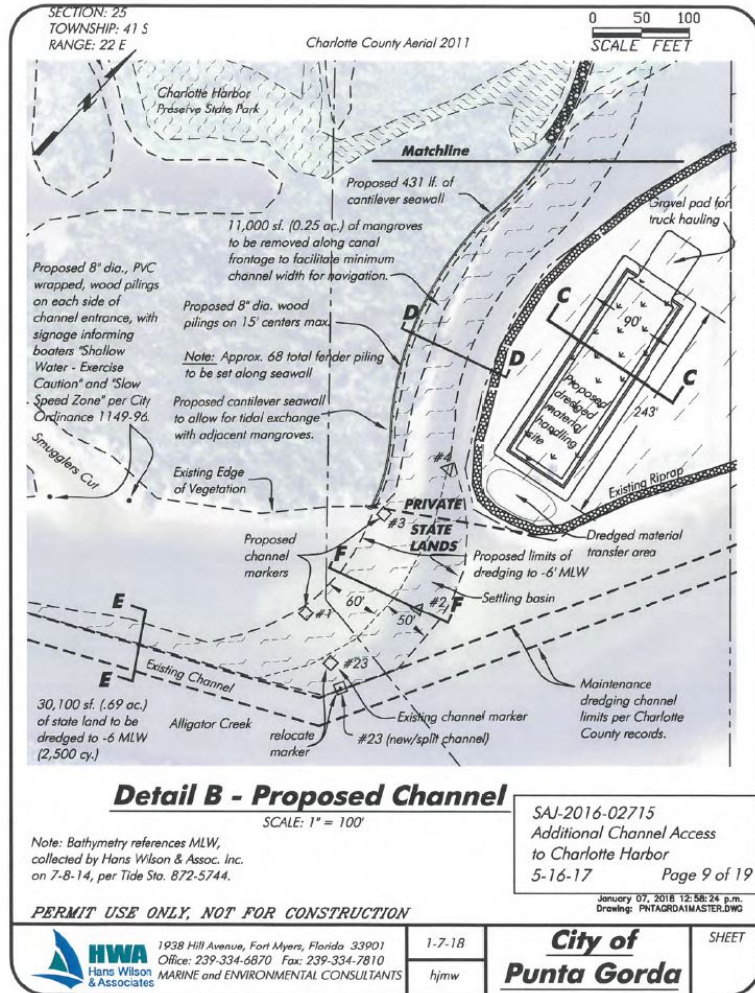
Detail B in Figure 1, showing the dredging/excavation, mangrove removal, cantilever seawall along the unnamed canal and as well as the settling basin and placement of piles at Smuggler’s Cut in Alligator Creek (Image supplied by USACE).
